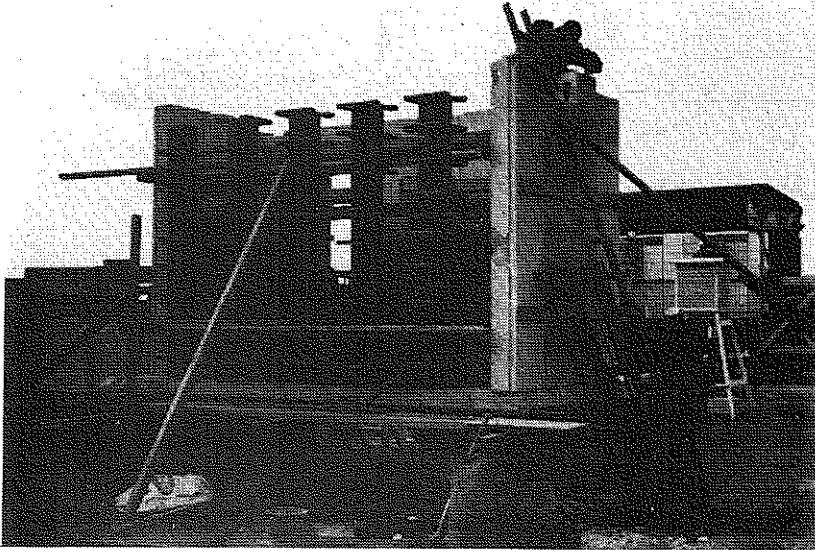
Concreting and constructing, south and east walls of test house II
